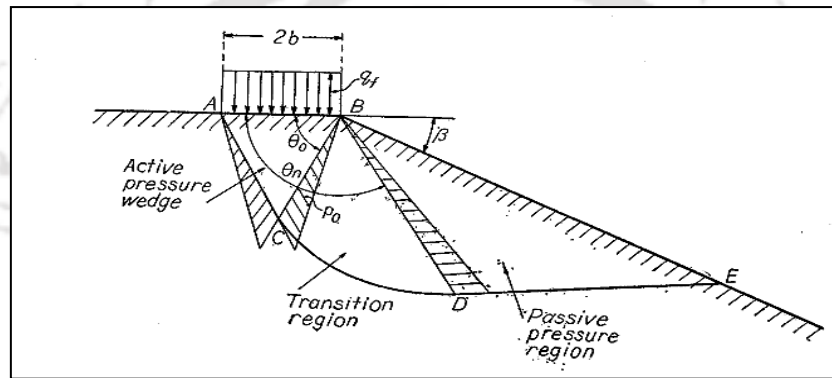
Failure zones for footings located on the crest and at the edge of slope face (Mizuno et al. 1960)
